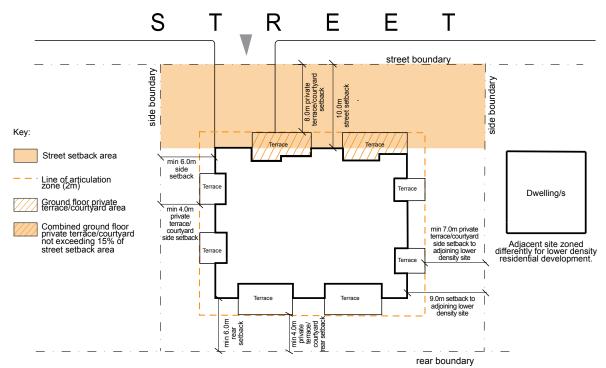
A.3-6: Setback controls for ground floor private terrace/courtyard and controls for ground floor terrace area encroachment to the street setback area.
